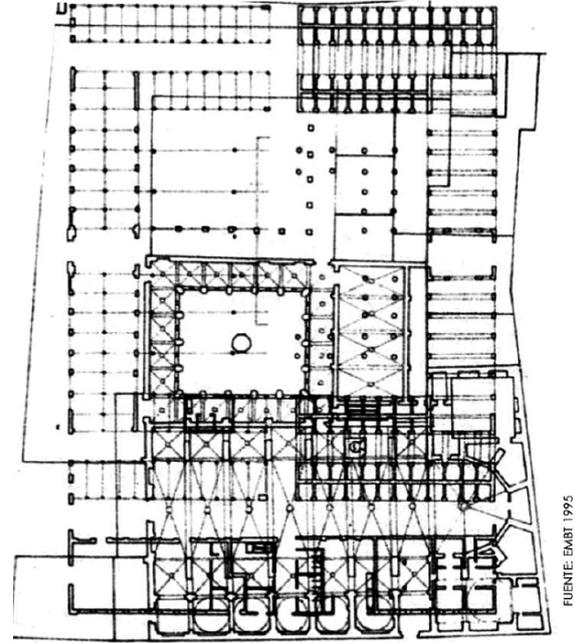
RIGHT BELOW: Plan of the new market showing the new urban plan to the north east (EMBT).
